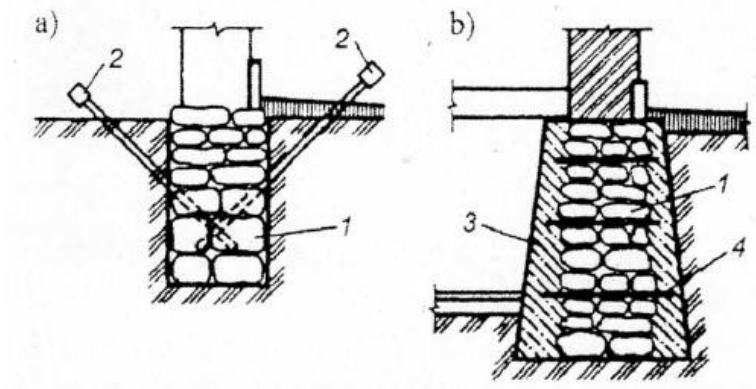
Strengthening of foundations: a) injection; b) concrete lining; 1 - Existing foundation, 2 - Injectors, 3 - Concrete cladding, 4 - Anchors
